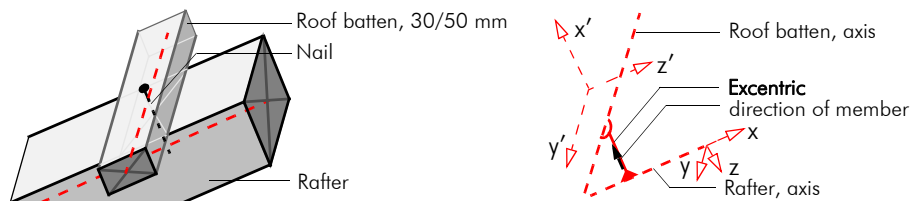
Modelling of the roof batten-rafter-joint connection.
